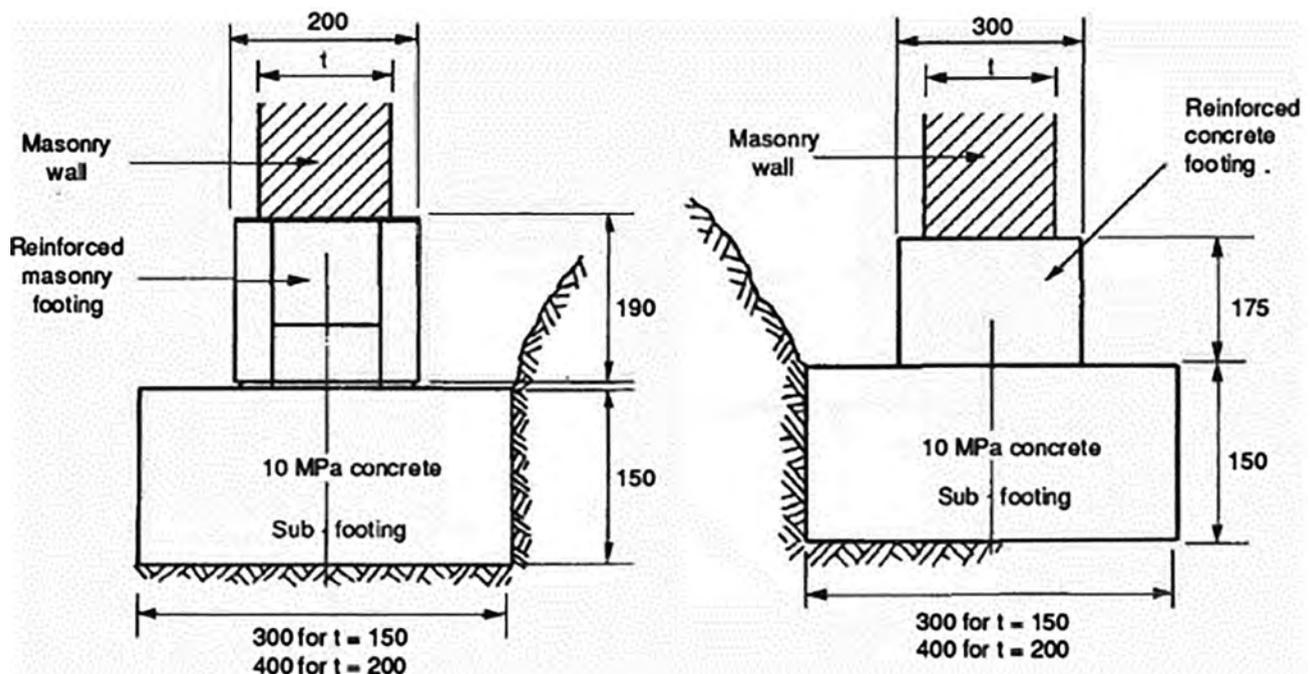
MASS CONCRETE SUB-FOOTING
